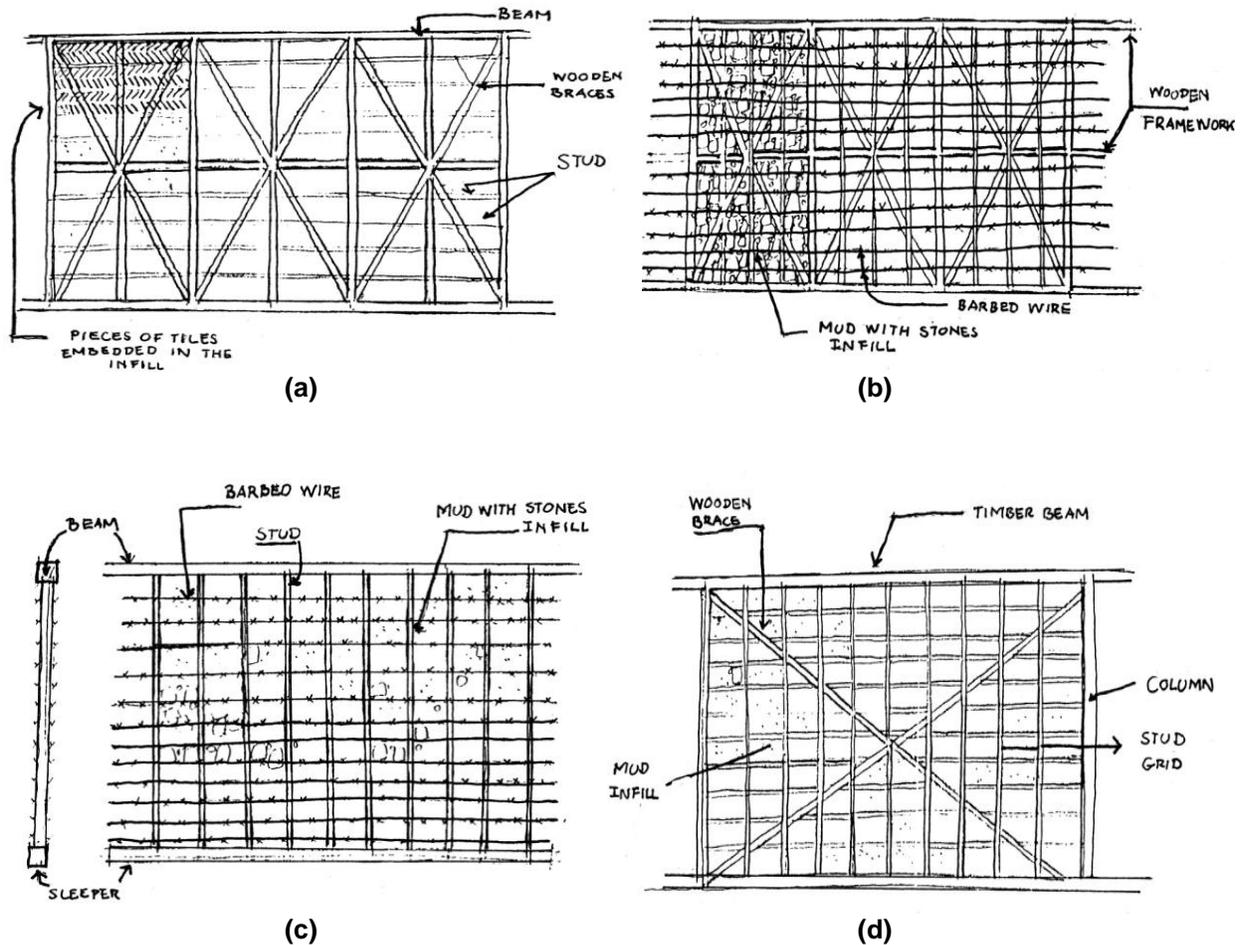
(a) Framework using wooden braces and studs, mud employed as infill and cover, top left. (b) Framework of wood reinforced with barbed wire, pebbles and mud uses as infill, mud cover, top right. (c) Framework made of studs reinforced with barbed wire, infill of mud and stones, mud cover, bottom left. (d) Framework made of wooden columns and stud grids, infilled and covered by mud (Moisa y Medrano [10]).
